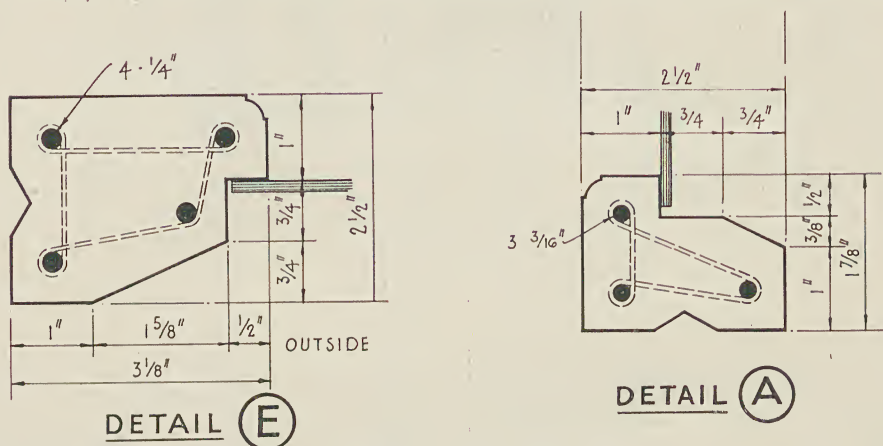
SECTIONS OF MEMBERS OF CONCRETE WINDOW FRAMES.
